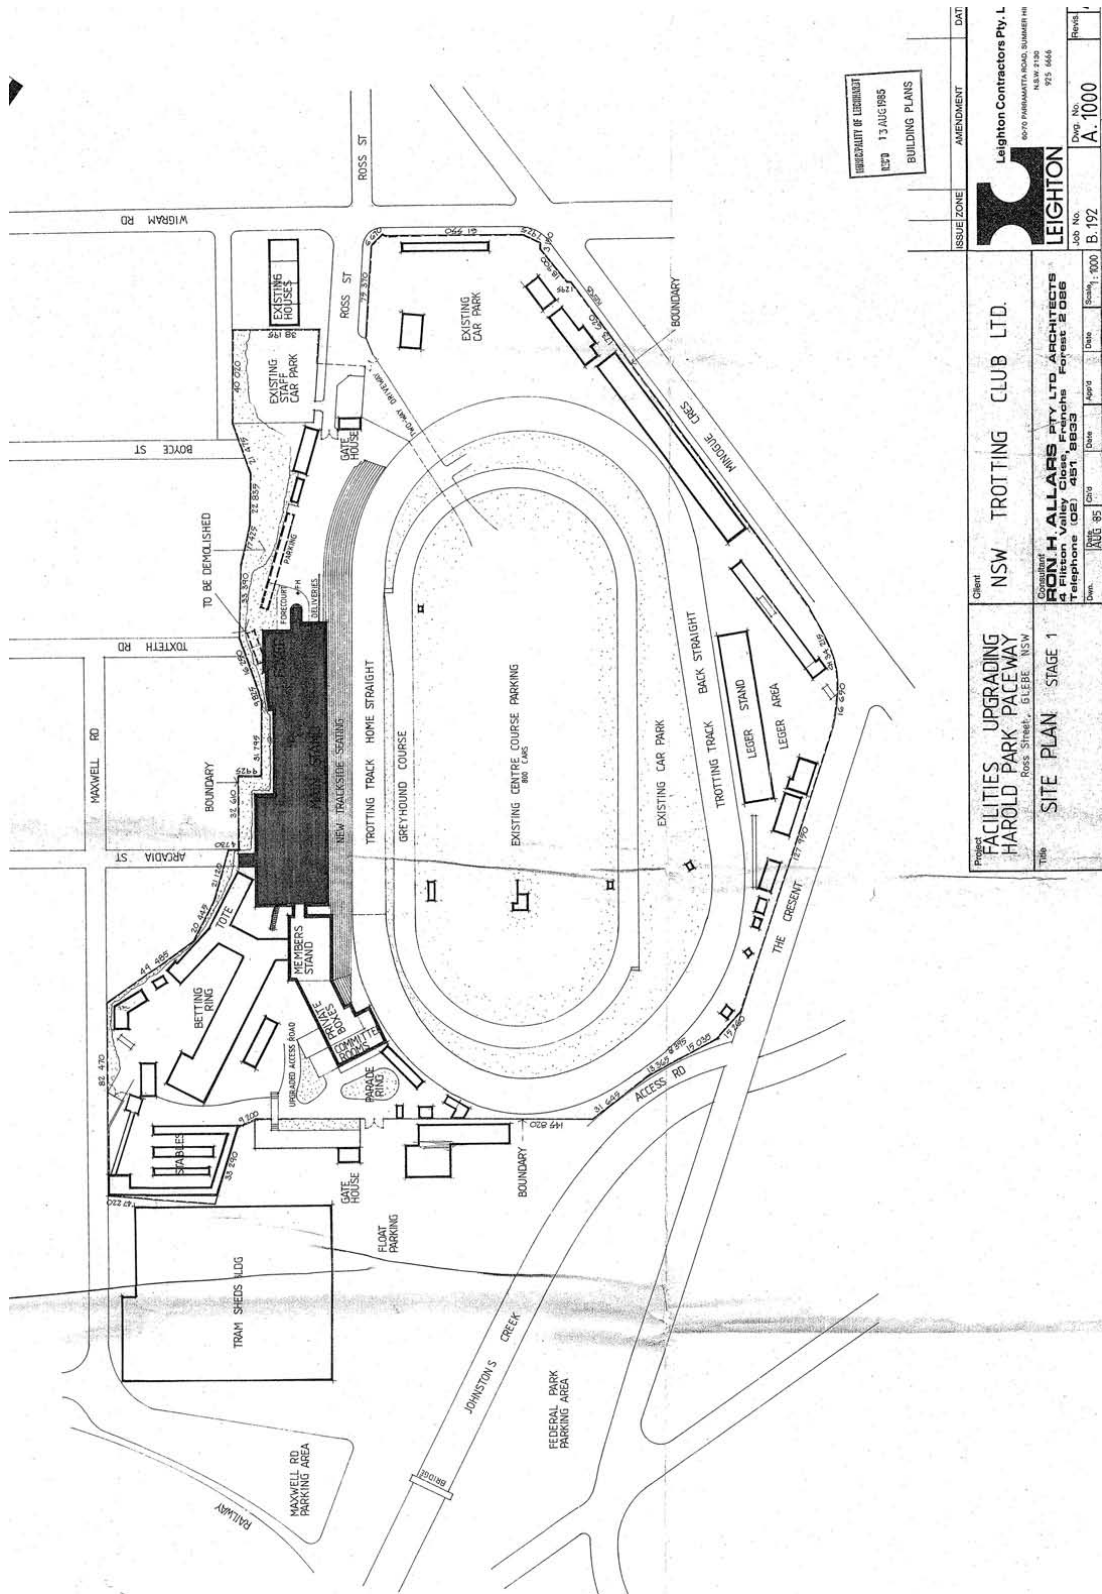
1987 Building Application Plan. Sydney City Archives
